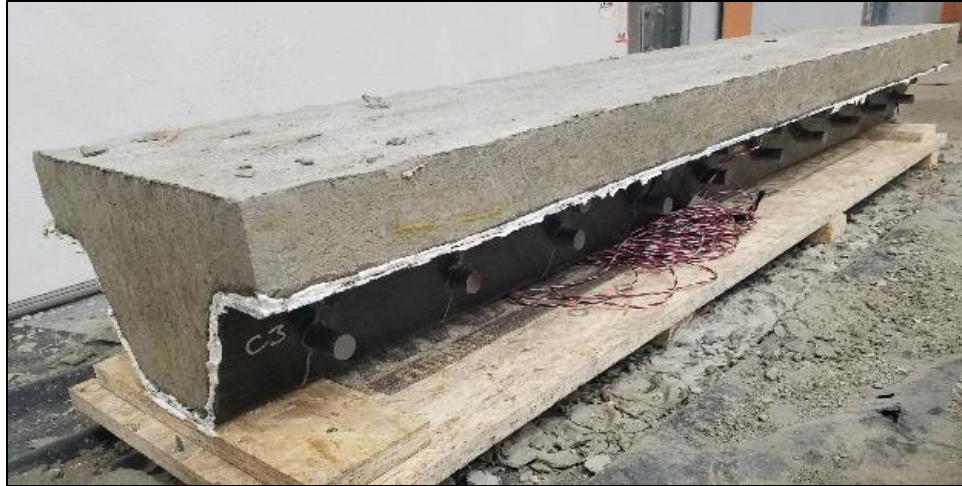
Composite CFRTP-concrete beam specimen, 2 days after pour
